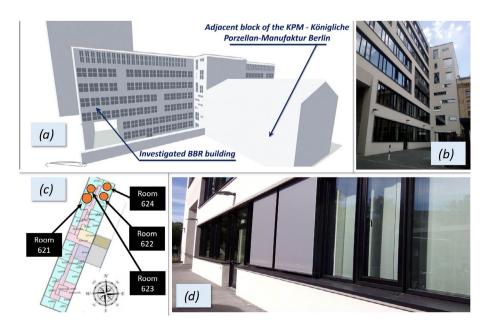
Pictures and model of the investigated building in Berlin: (a) 3D model, (b) entrance, (c) plan of the sixth floor and (d) west façade.
